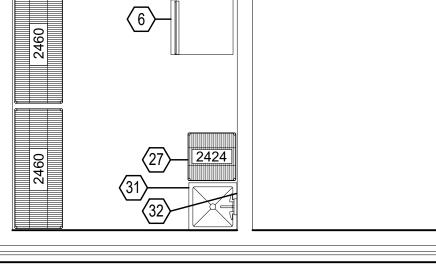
### EXHIBIT E: TIMNATH STADIUM CONCESSIONS FLOOR PLANS & PHOTOS
